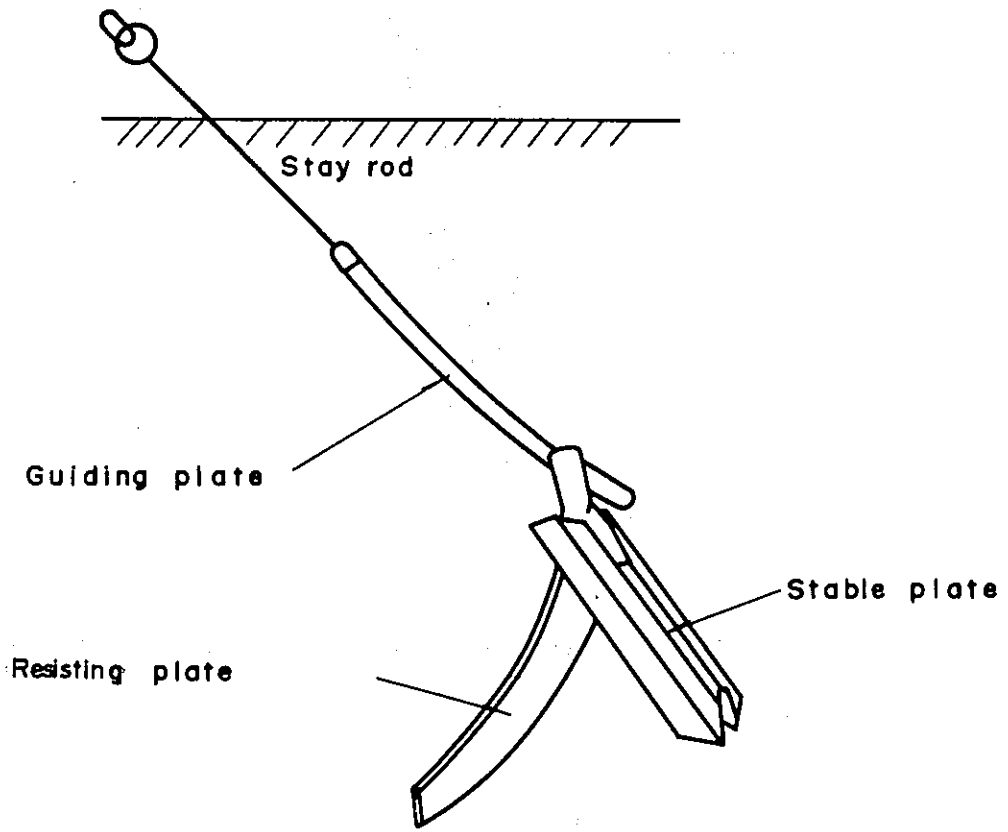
Installation of Stay Anchor (⁴/₄)
